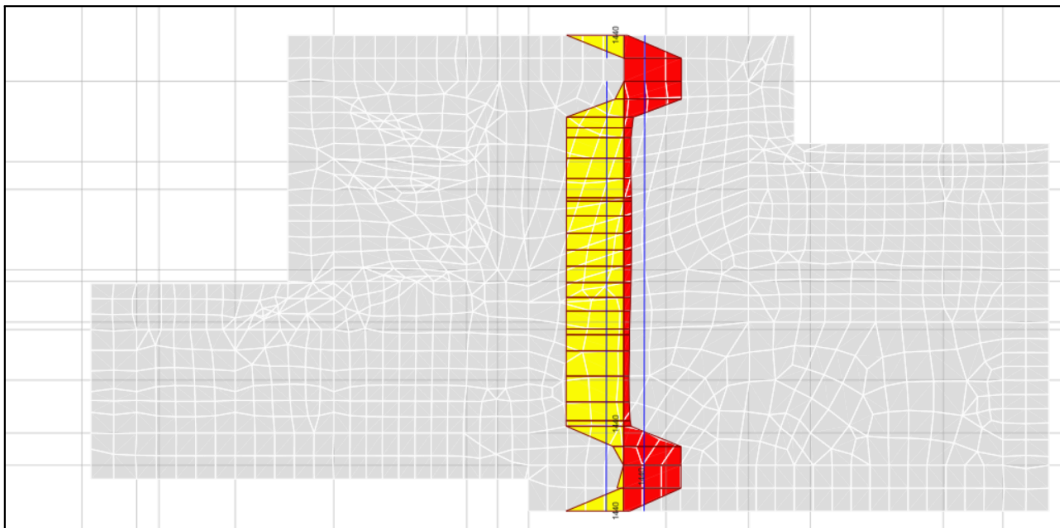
Flexural reinforcement of mat foundation in direction 2; Y-direction
